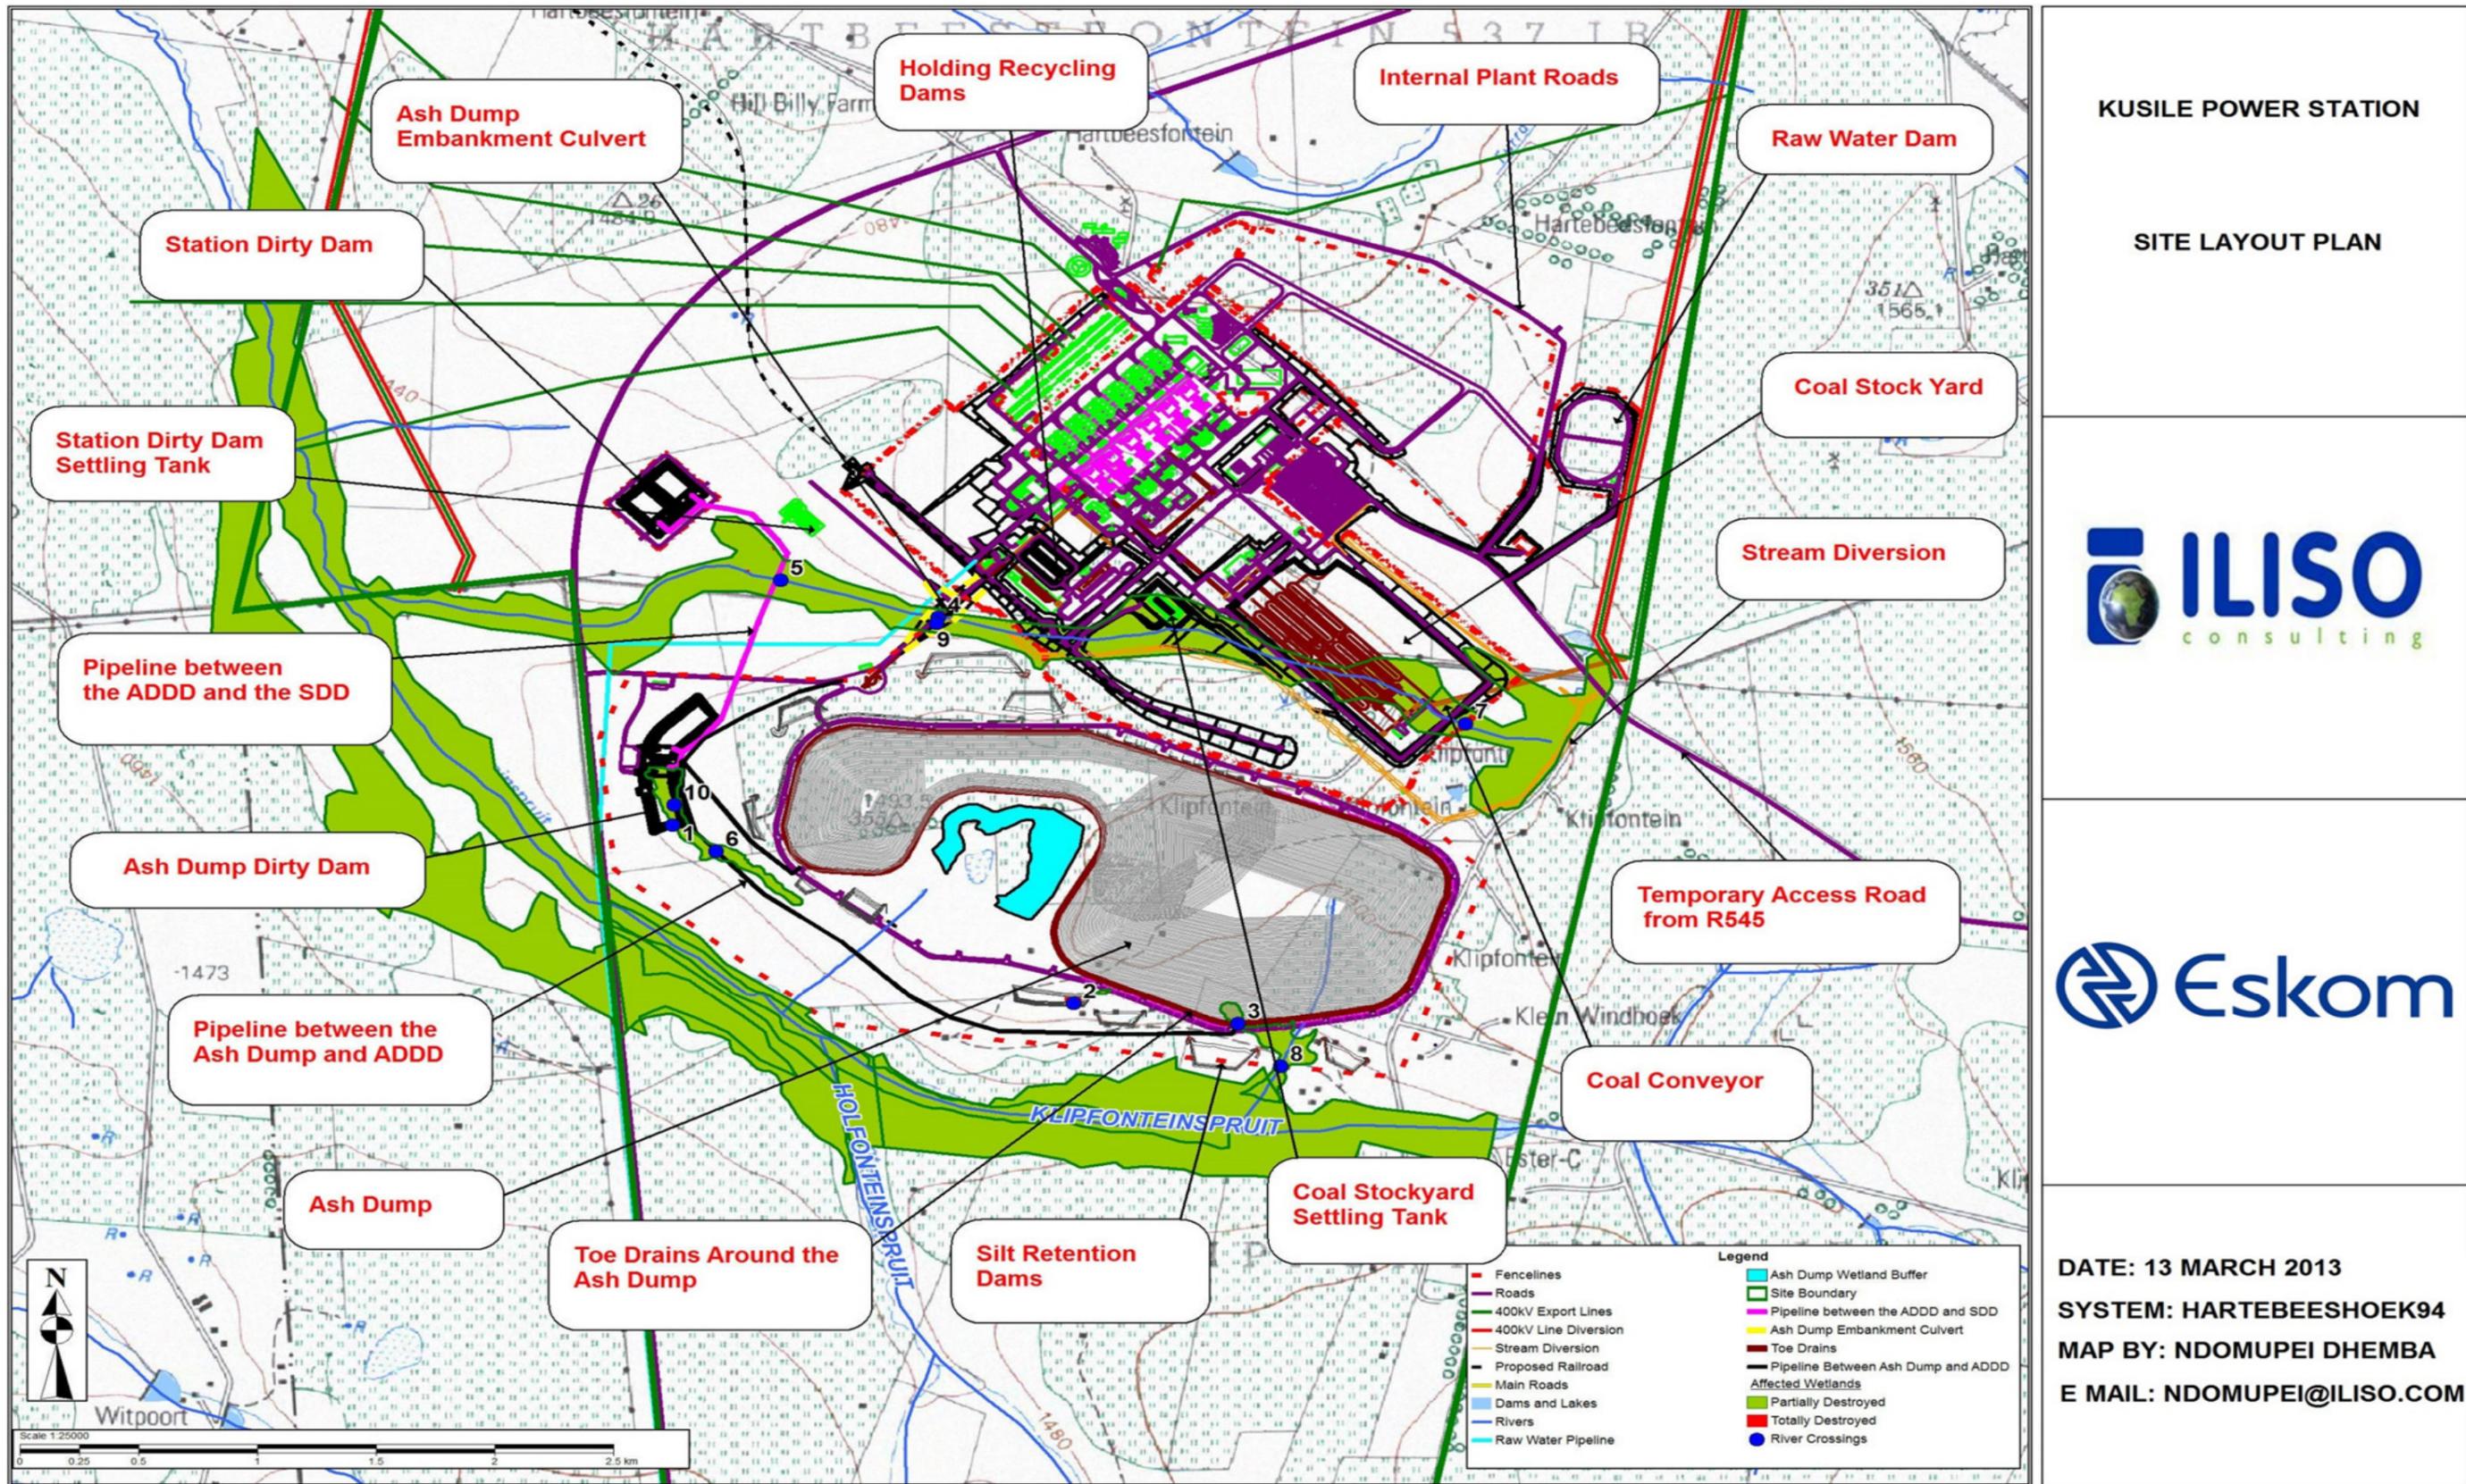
Kusile Site Layout Plan showing the River and Wetland Crossings being Applied For
